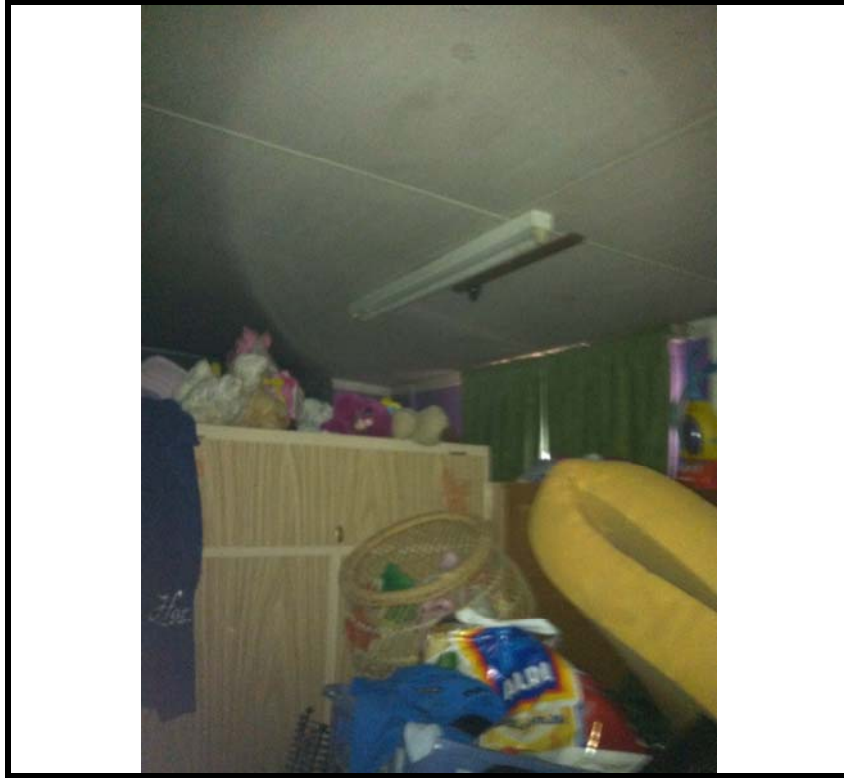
Example of the ACM sheeting in the ceiling and the potentially PCB-containing fluorescent lights used in the brick section of 5 McLeod Road.
